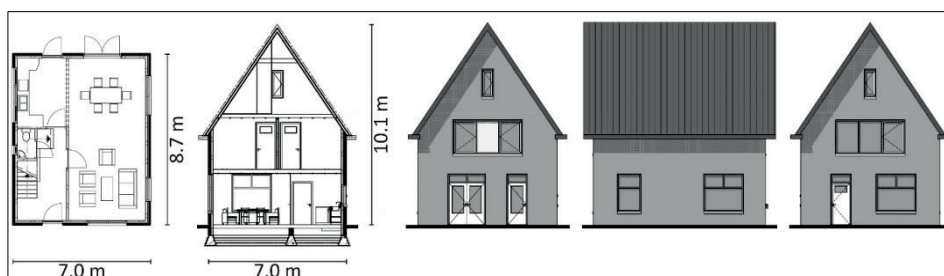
Detached dwelling: floor plan, cross section and facades (back, side, and front).
